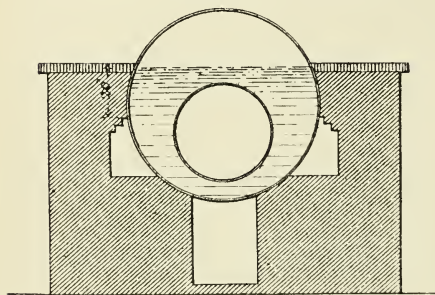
FAULTILY SEATED CORNISH BOILER.
